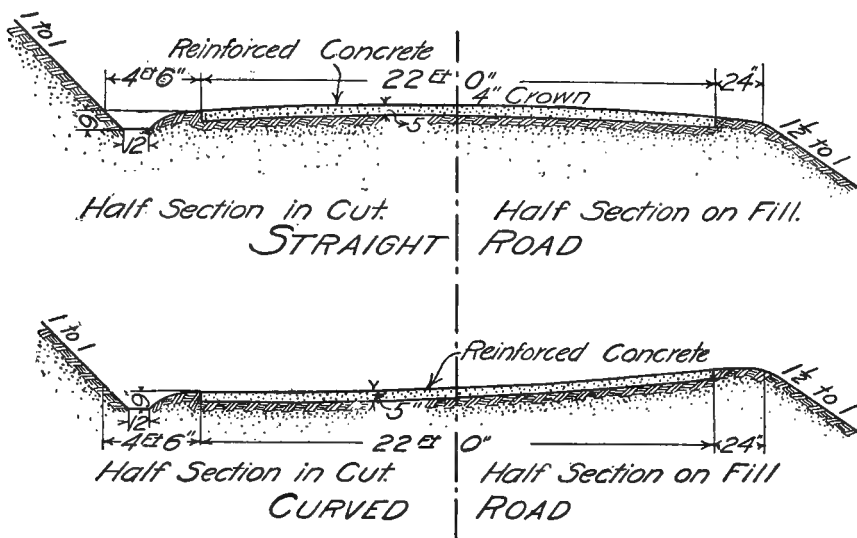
TYPICAL CROSS SECTION OF LONG ISLAND MOTOR PARKWAY.
